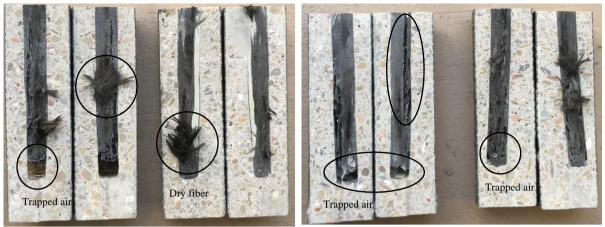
Cut concrete samples showing RFB anchor conditions within drilled hole
